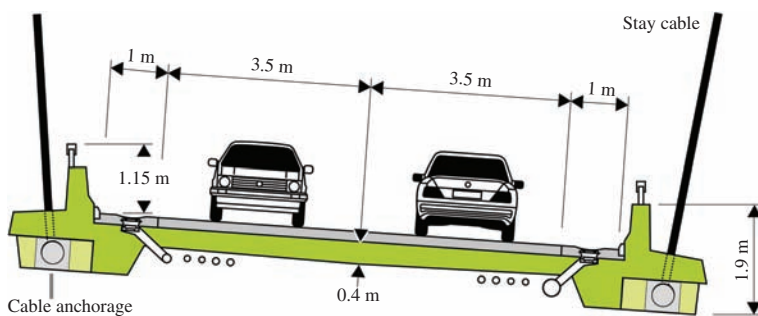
Cross-section of the bridge girder, inclined by 7% because of the curved horizontal road alignment
